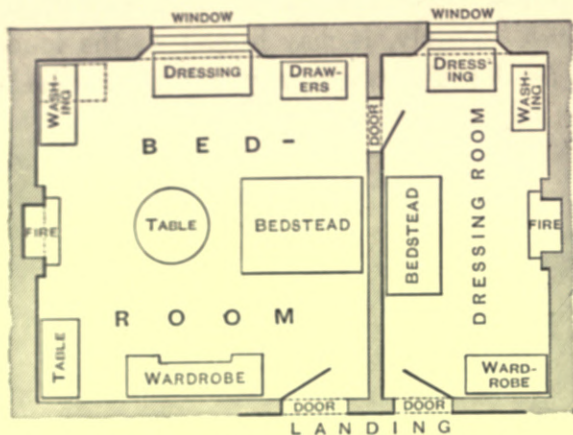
Bedroom and Dressing-room. Alternative to Fig. 8.
